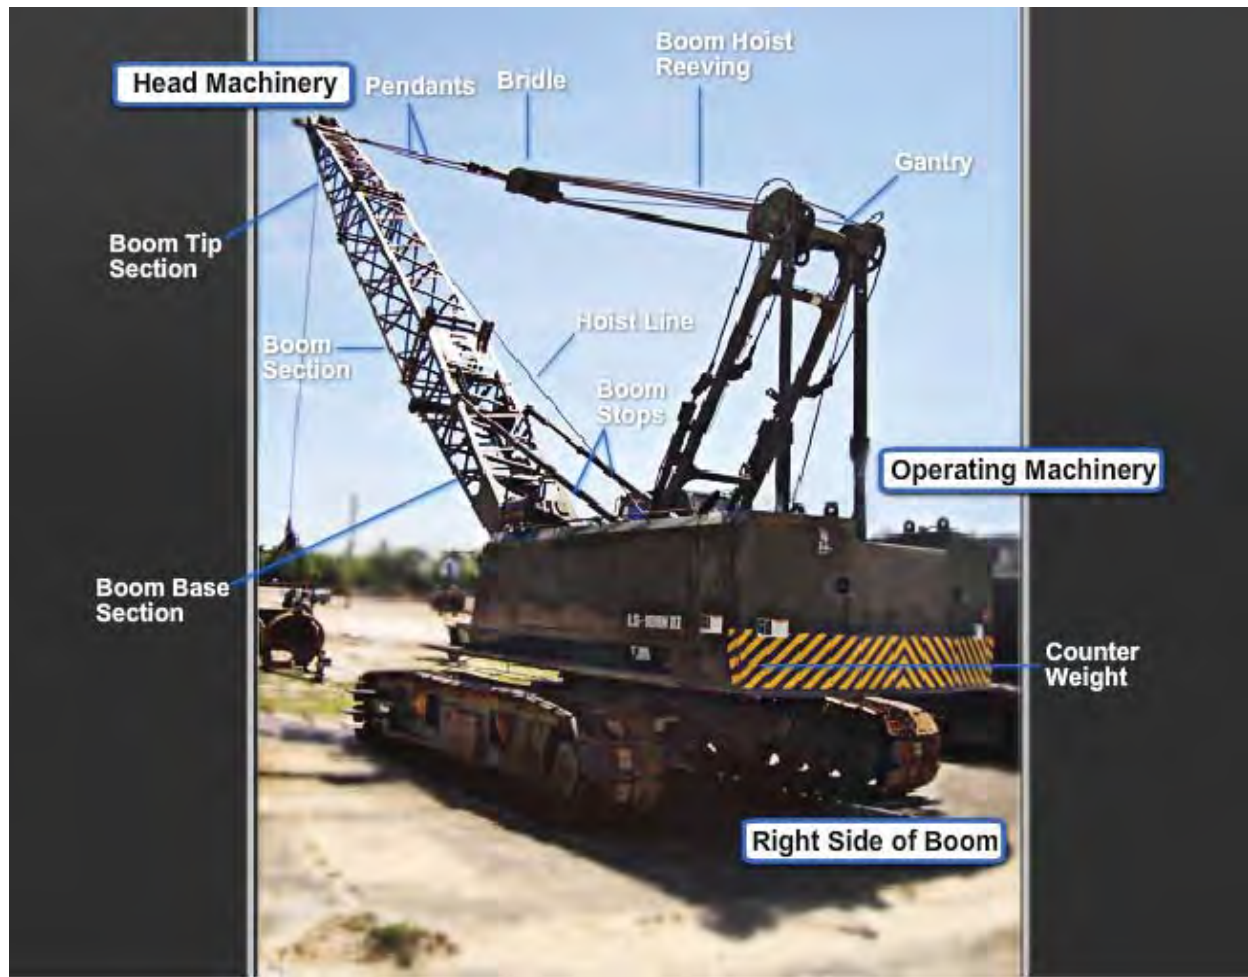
Major components of a lattice boom crawler-mounted crane.
